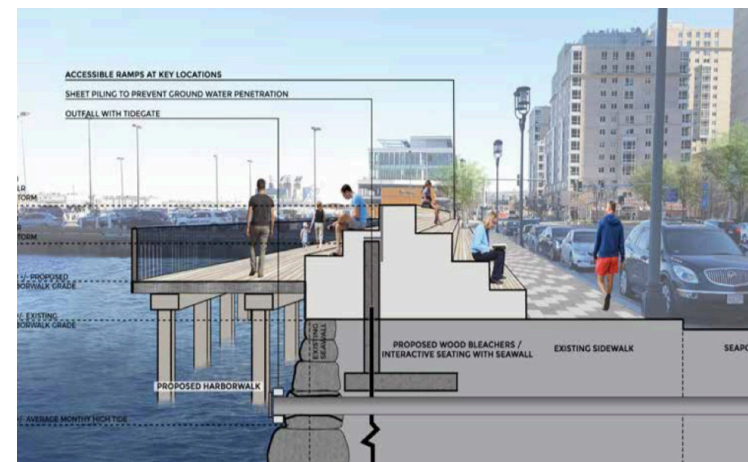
Proposed design for elevating the Harborwalk and adding a stepped sidewalk.
